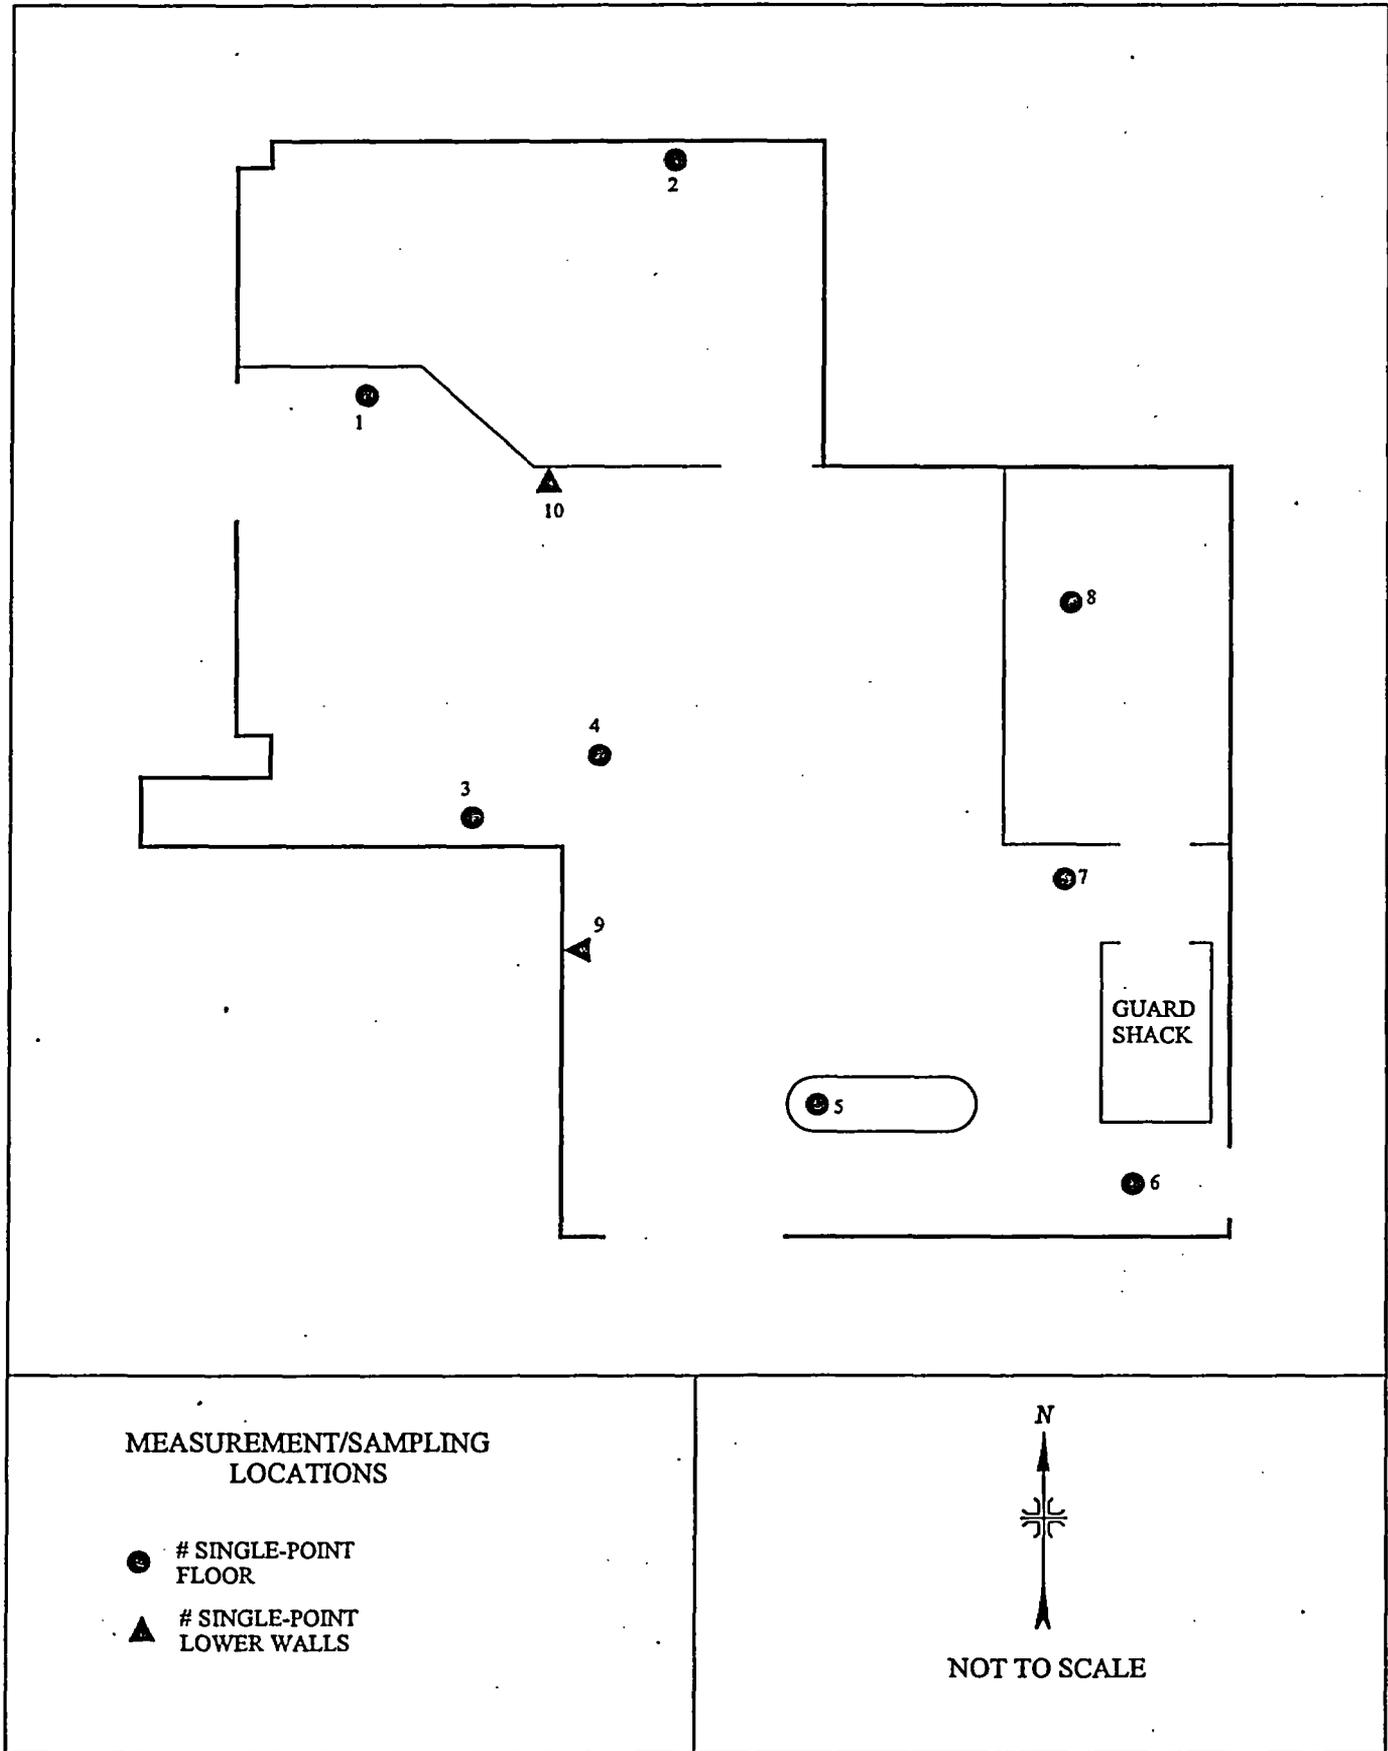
Administration Building, First Floor, Area 1 - Measurement and Sampling Locations
